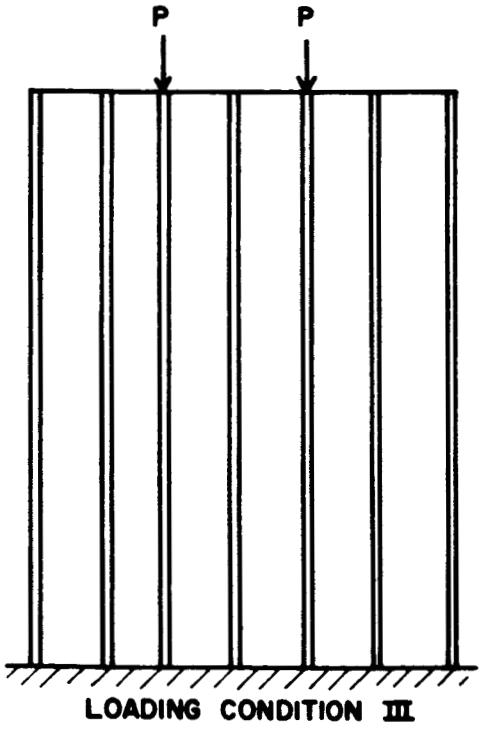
TYPICAL LOADING ARRANGEMENT.
